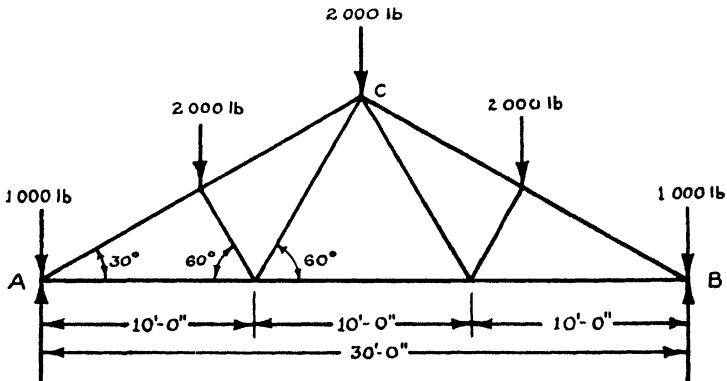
THIRTY-FOOT SPAN ROOF TRUSS
